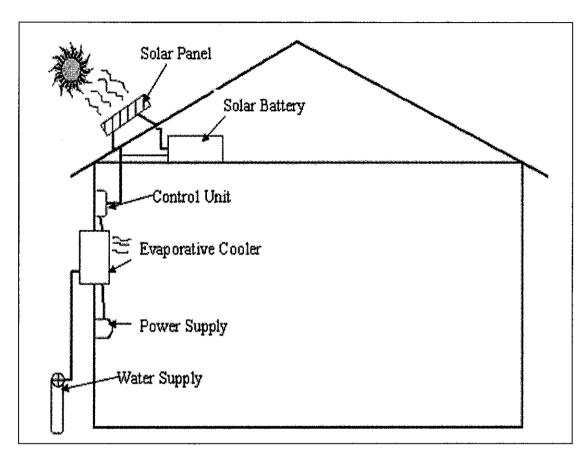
Plan of the evaporative cooling system placing to the house
